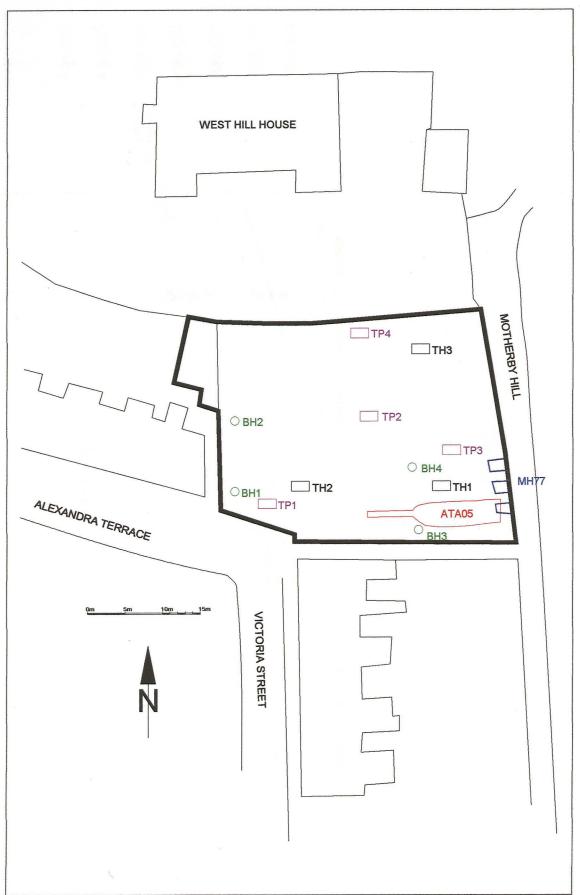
Evaluation trench, trial hole and borehole location plan (scale 1:500).
